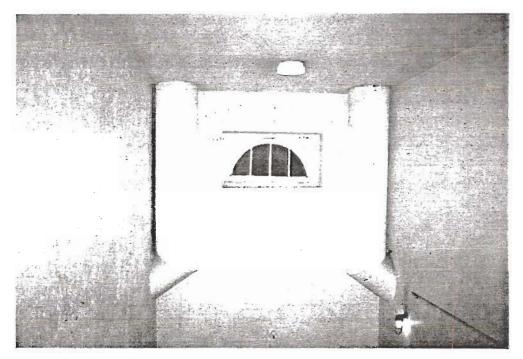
Metal Vents at Landing Between Second and Third Floors. (Looking North)
